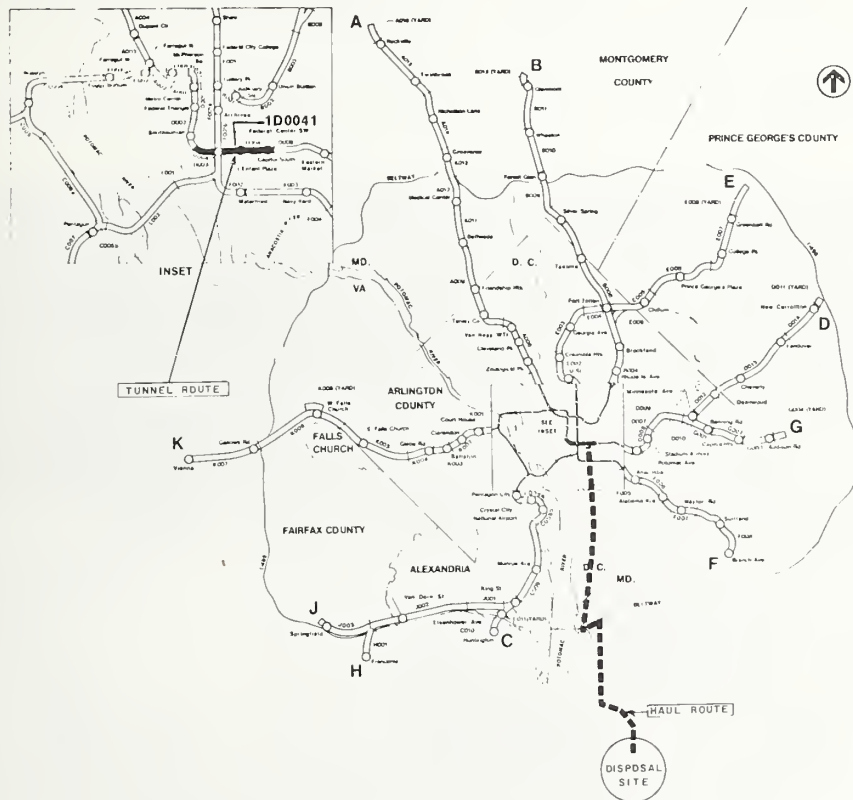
LOCATION PLAN - METRO CONTRACT D4a
